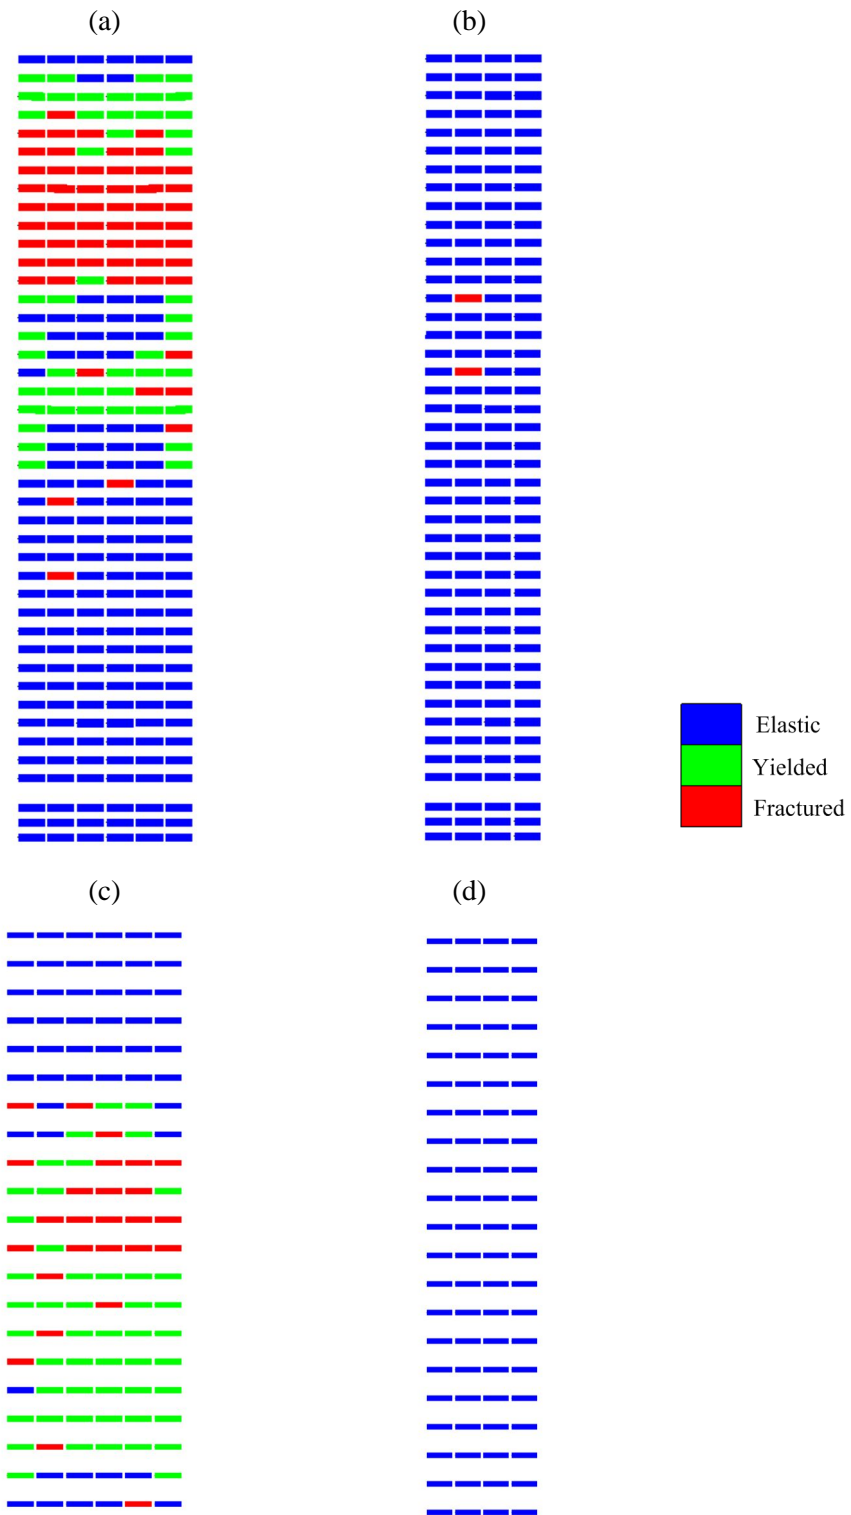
Archetype 40-storey (a, b) and 20-storey (c, d) building beam performance for sample long (a, c) and short (b, d) building elevations in Oakland.
